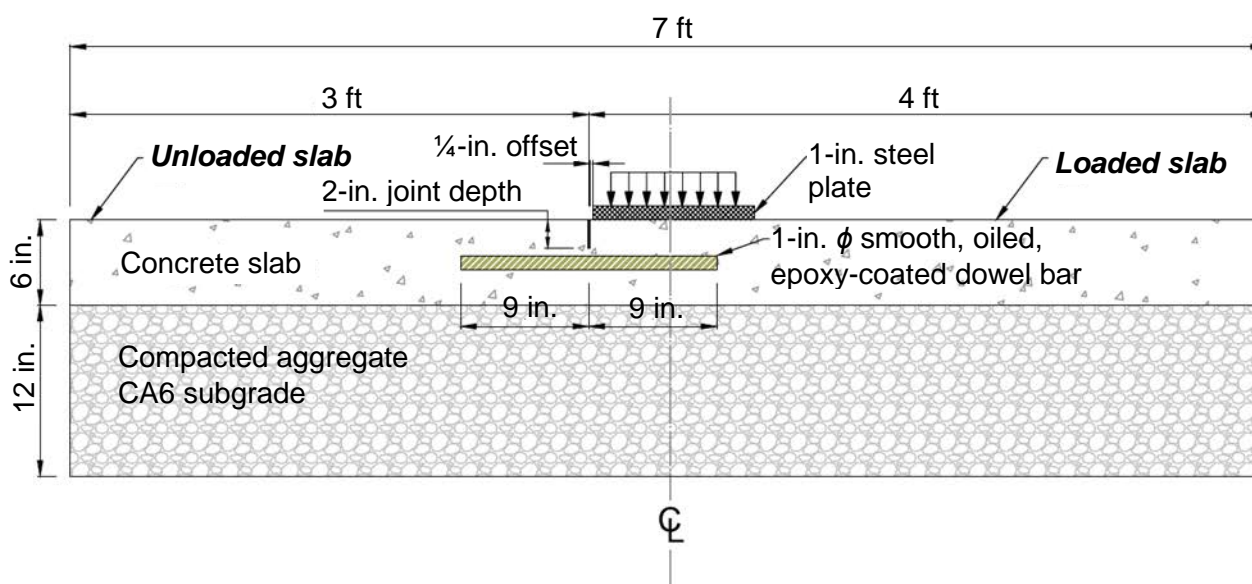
Test configuration of slab, dowels, and loading plate geometry (elevation view).
